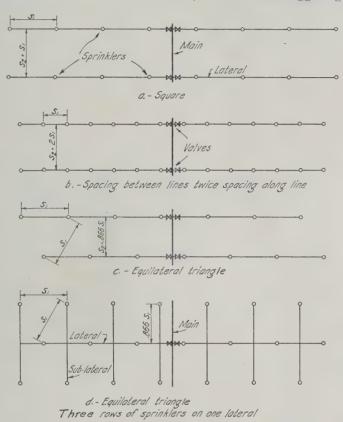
Some of the various arrangements of sprinklers and pipe lines for sprinkler systems. The letters  $S_1$  and  $S_2$  denote spacing between sprinklers, and spacing between pipe lines, respectively.
